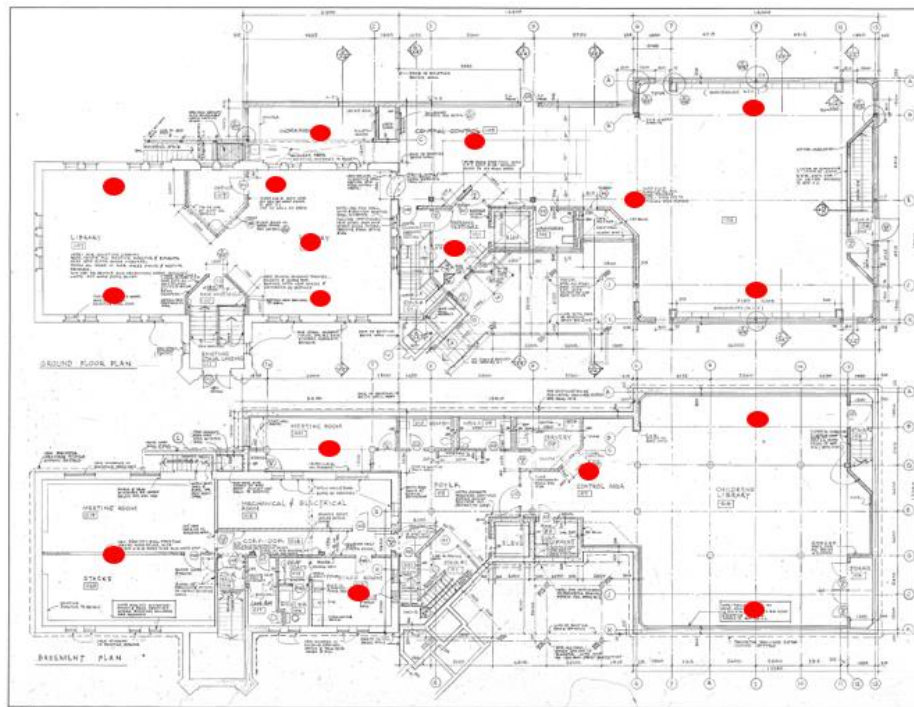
Sampling Location on Building Plan (Dunlop, Farrow & Aitken, 1980)
